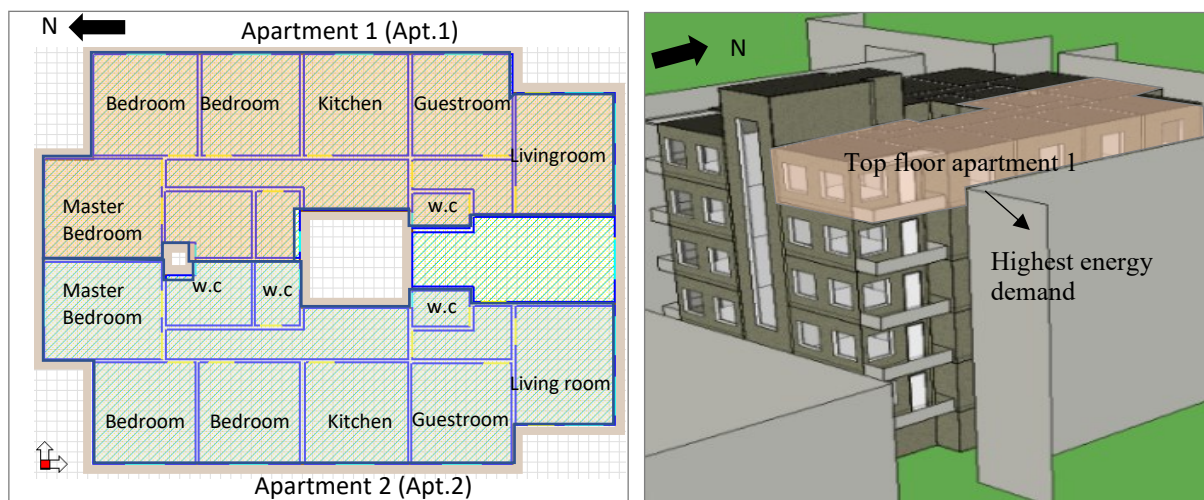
Floor plan and 3d view of the simulated apartment building.
